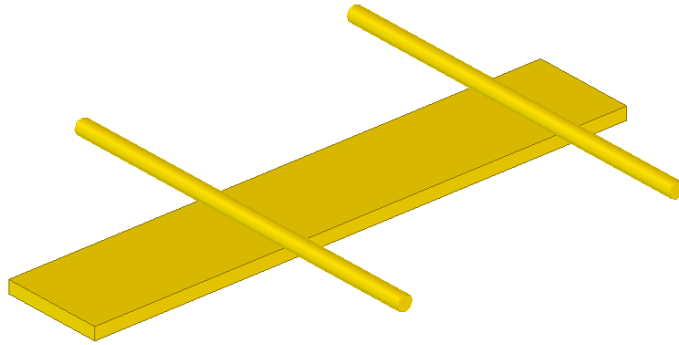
The steel component KBA-5, which comprises of a steel plate welded together with two reinforcement bars.
